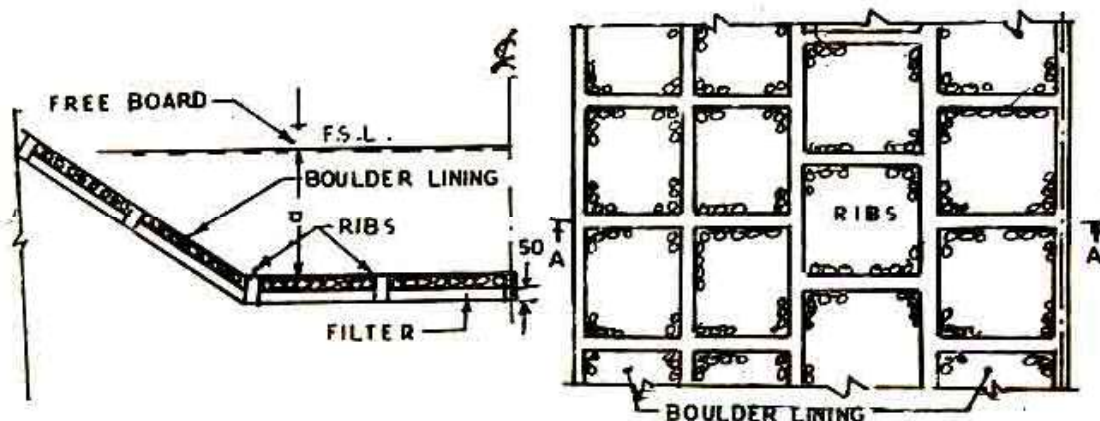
Illustratory Layout Of Pitched Lining For Canal
